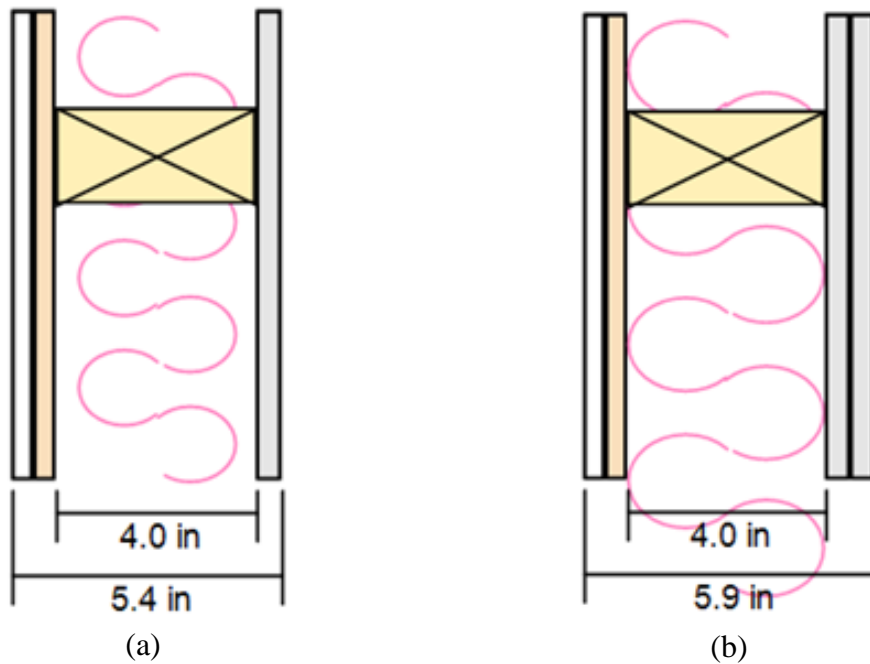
(a) Single and (b) double layer gypsum board Insul wall models
